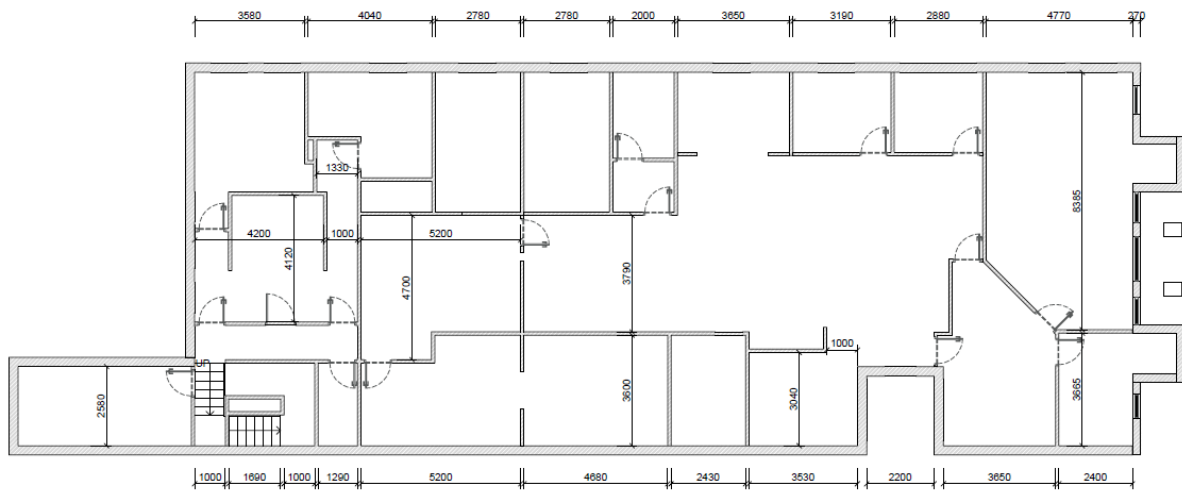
Existing first floor 368.82 m² (source: architectural plans)
